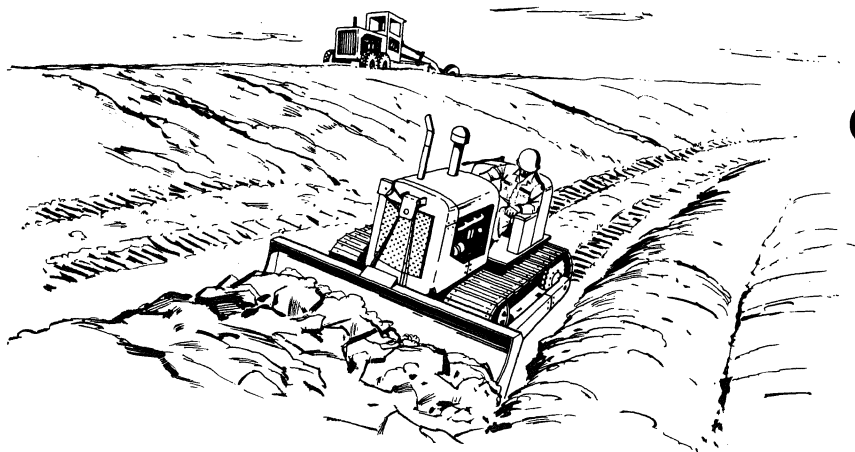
Dozer working parallel to right-of-way, finishing side slopes.
